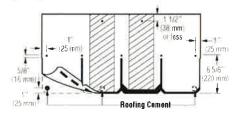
When installing Grand Manor Shangles on steep slopes, use seven nails and three spots of asphalt roofing cement.
